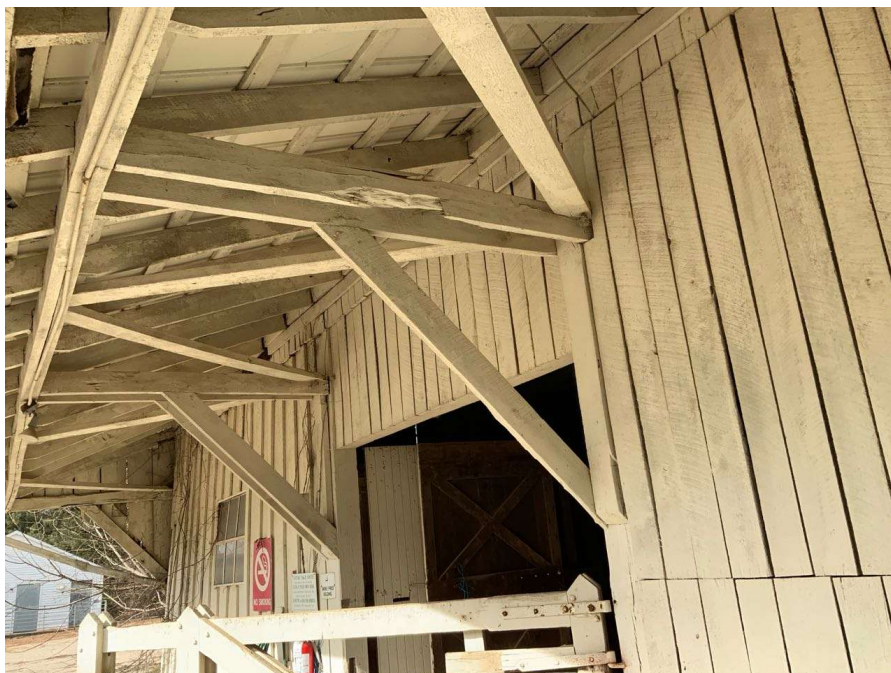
The east overhang support diagonal is missing, and the horizontal member is damaged at Column J/7.
